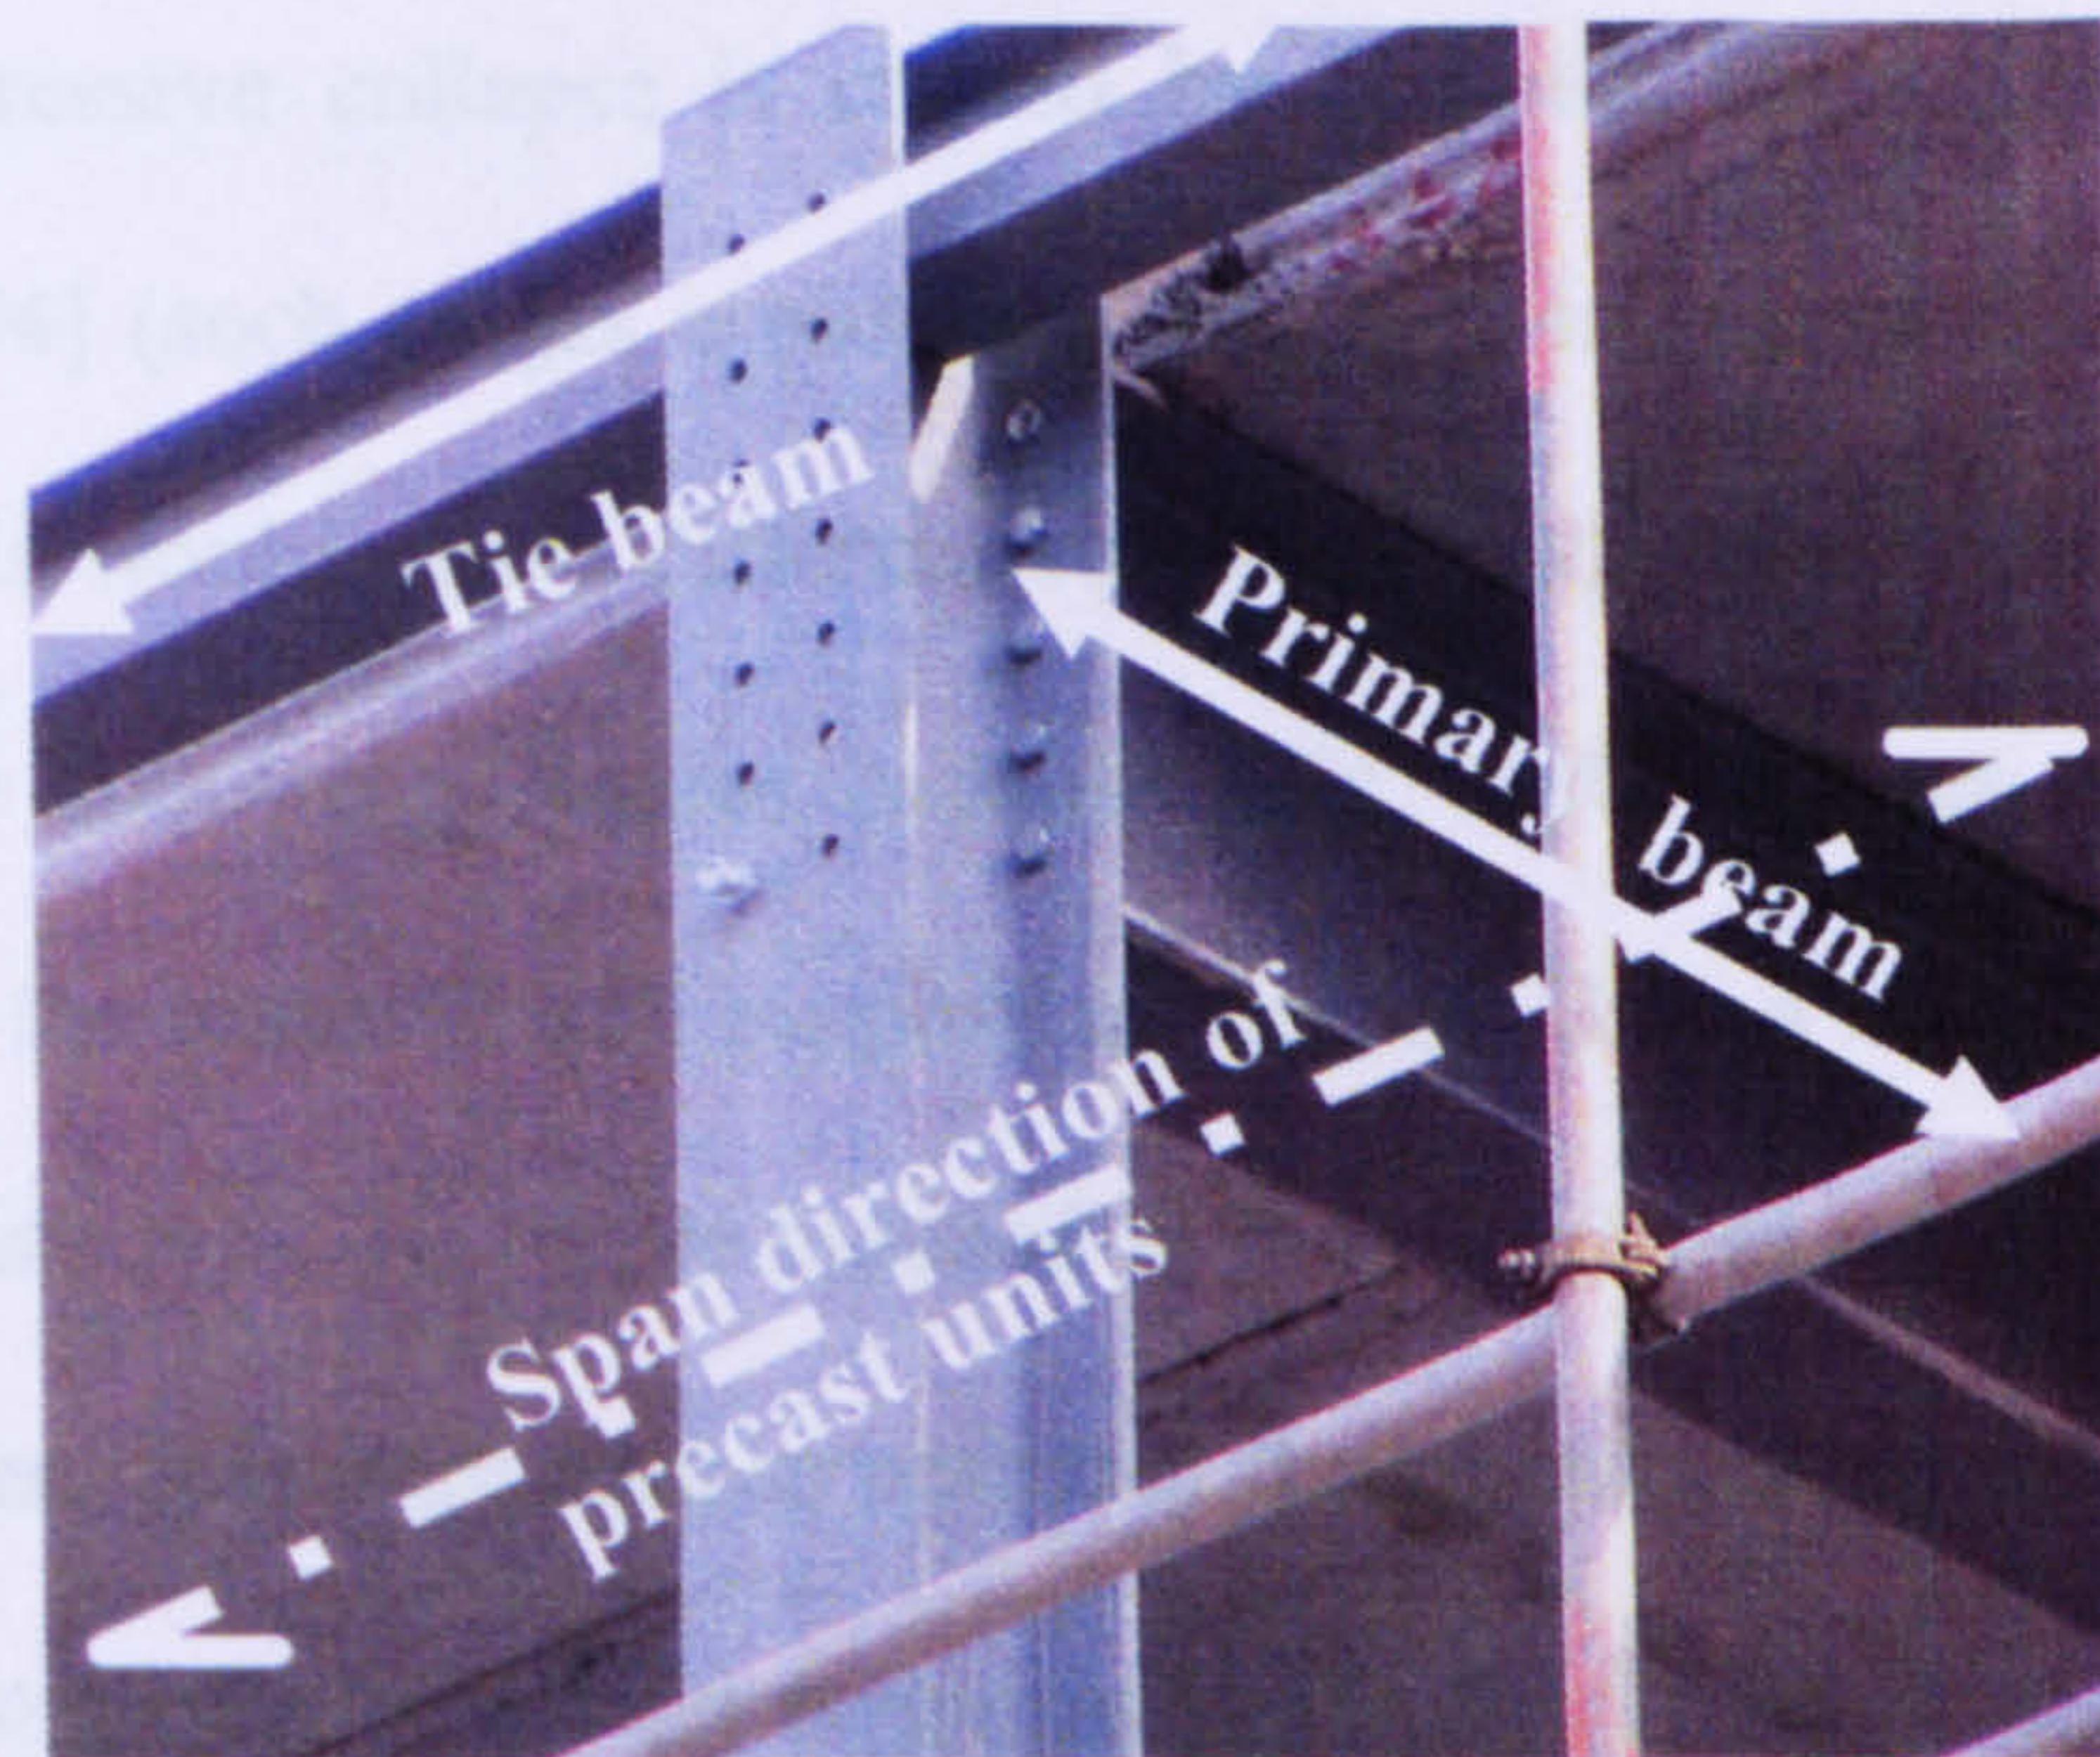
Illustration the Typical beam-to-column connection of a structure with precast units - photographed in 2004, Sheffield
